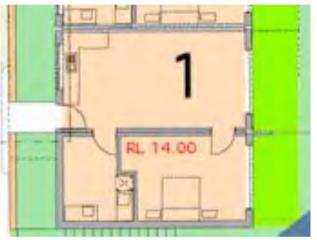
Proposed Plan for a 1-Bed Dwelling
